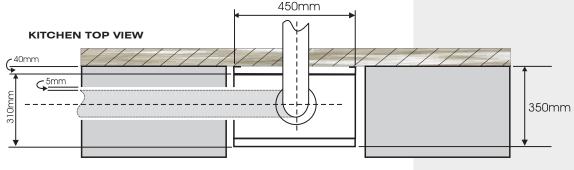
MINIMUM CLEARANCE  Note: 400mm dimension is a desired workable clearance for servicing
